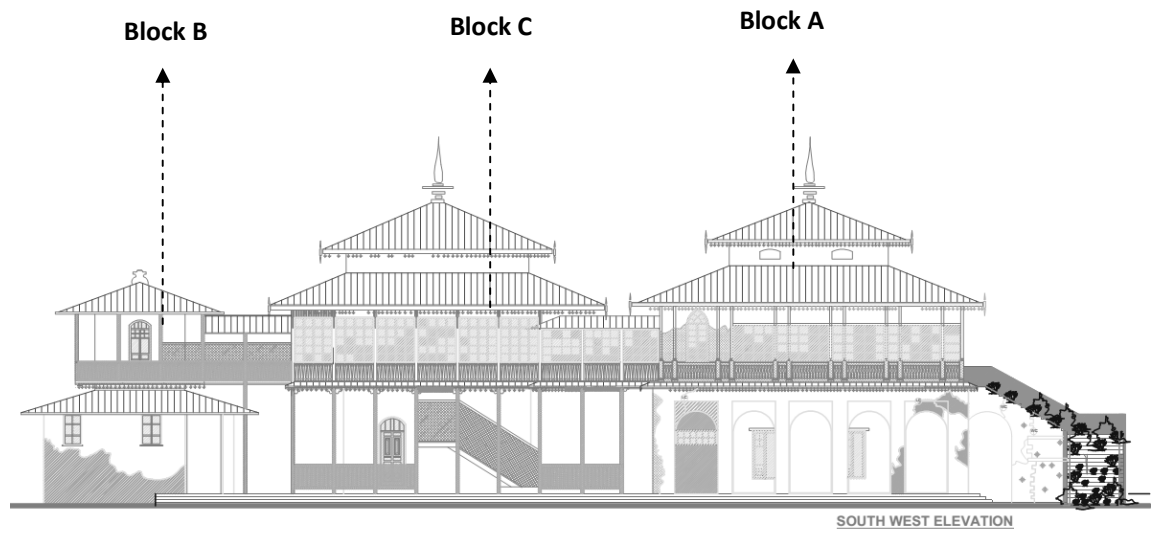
South West elevation drawing of the Palace building (Drawn by –Rahel lemma August 2017)
